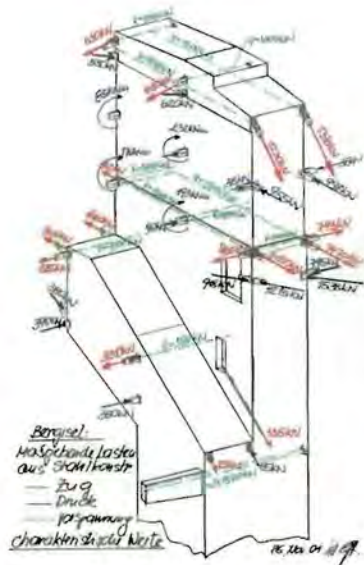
LEFT AND ABOVE – The docking station between the concrete tower and steel cage with prestressed bearing plates.
